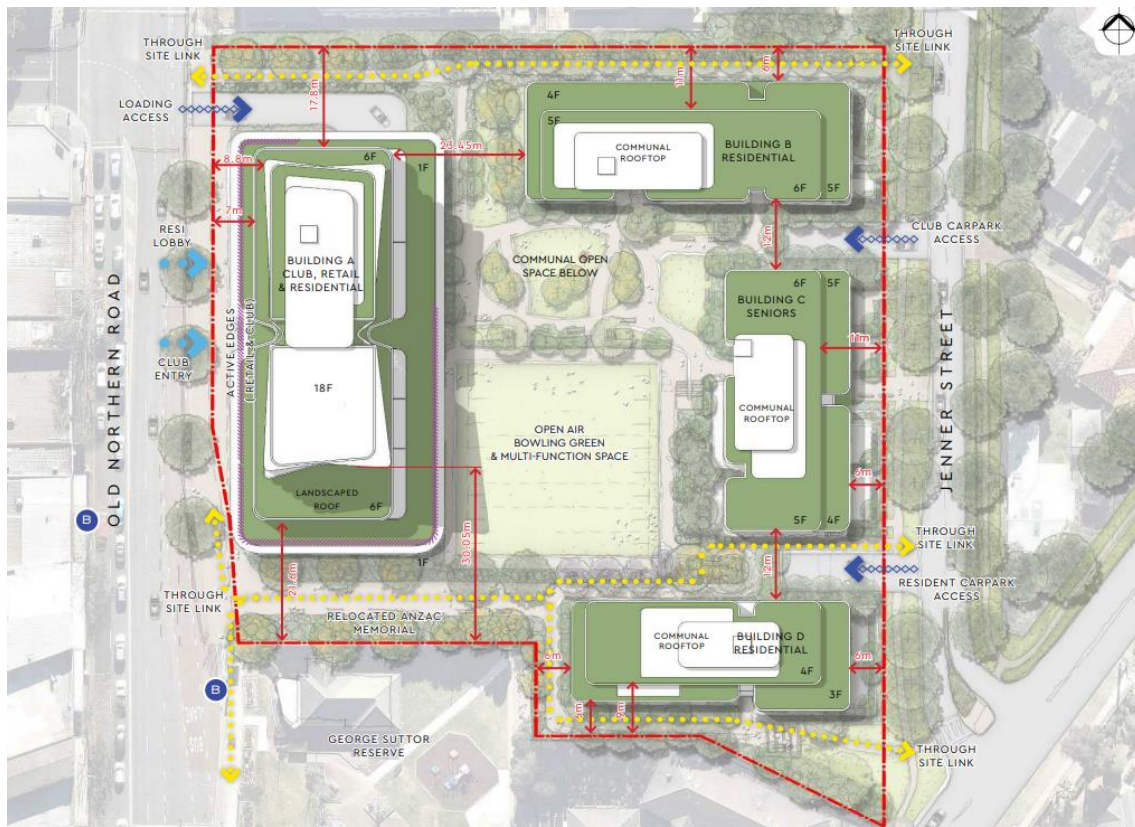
Indicative Site Layout and Building Height Plan (maximum number of storeys) (Source: Altis)
